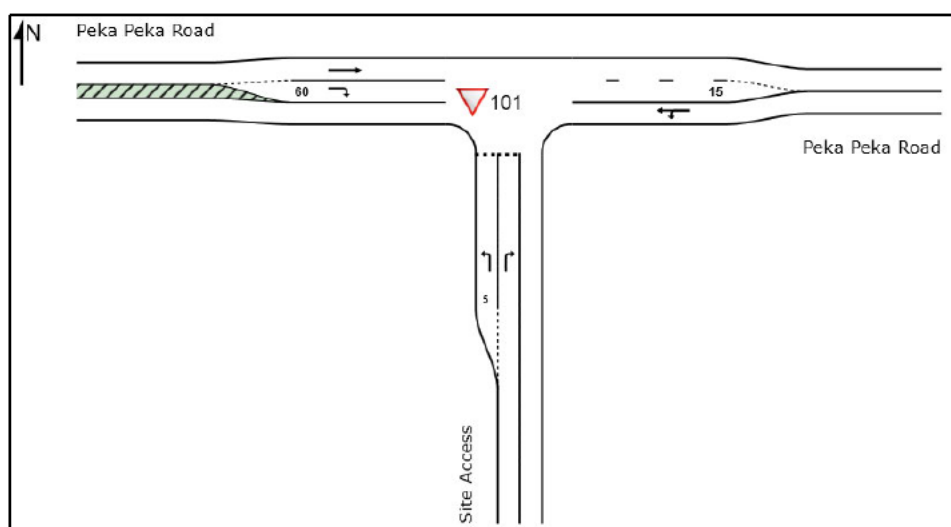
Proposed Site Access Intersection SIDRA Model Layout
